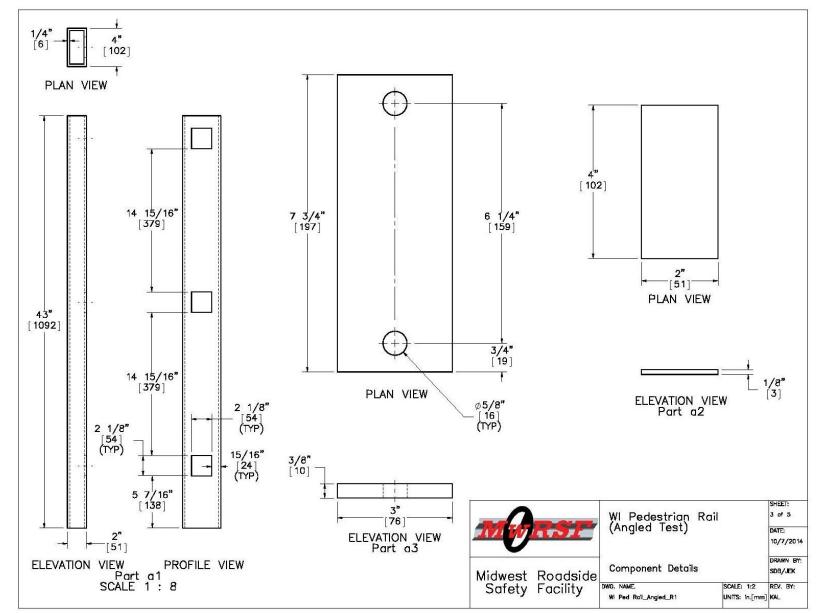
Component Details, Test Nos. APR-1 and APR-2
